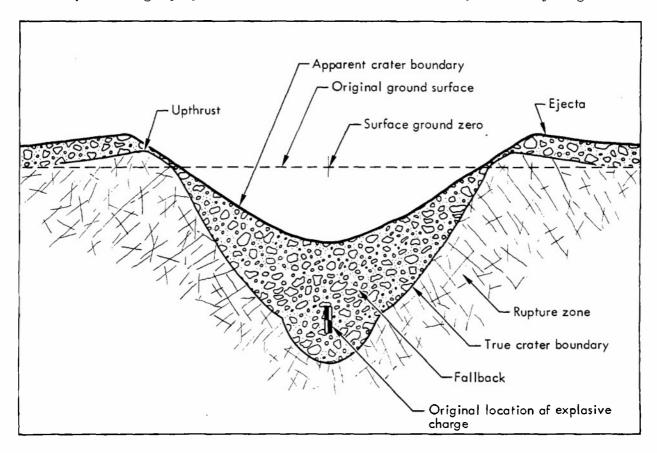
Cross section of typical crater in rock, showing nomenclature.
